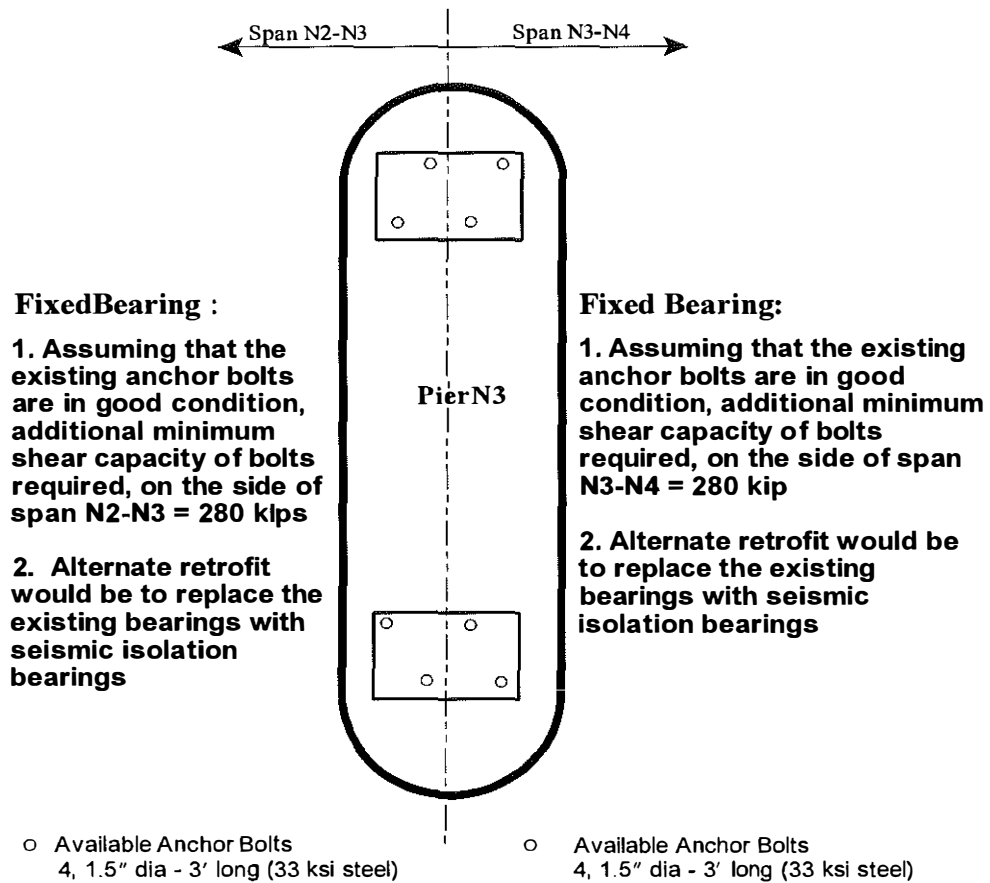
Minimum Required Shear Capacity ( $V_{req}$ ) to be Provided by Additional Anchor Bolts at Bearings of Pier N3 on the Evansville, IN Approach on the US41 Northbound Bridge
